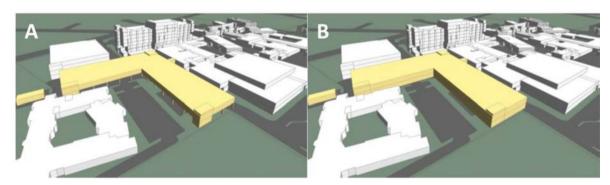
Two preliminary options for a prefabricated building on the Hutt Hospital site. Option A is a single storey building elevated over the existing ED carpark and roadway. Option B is a double storey building located in the existing ED carpark and roadway.
